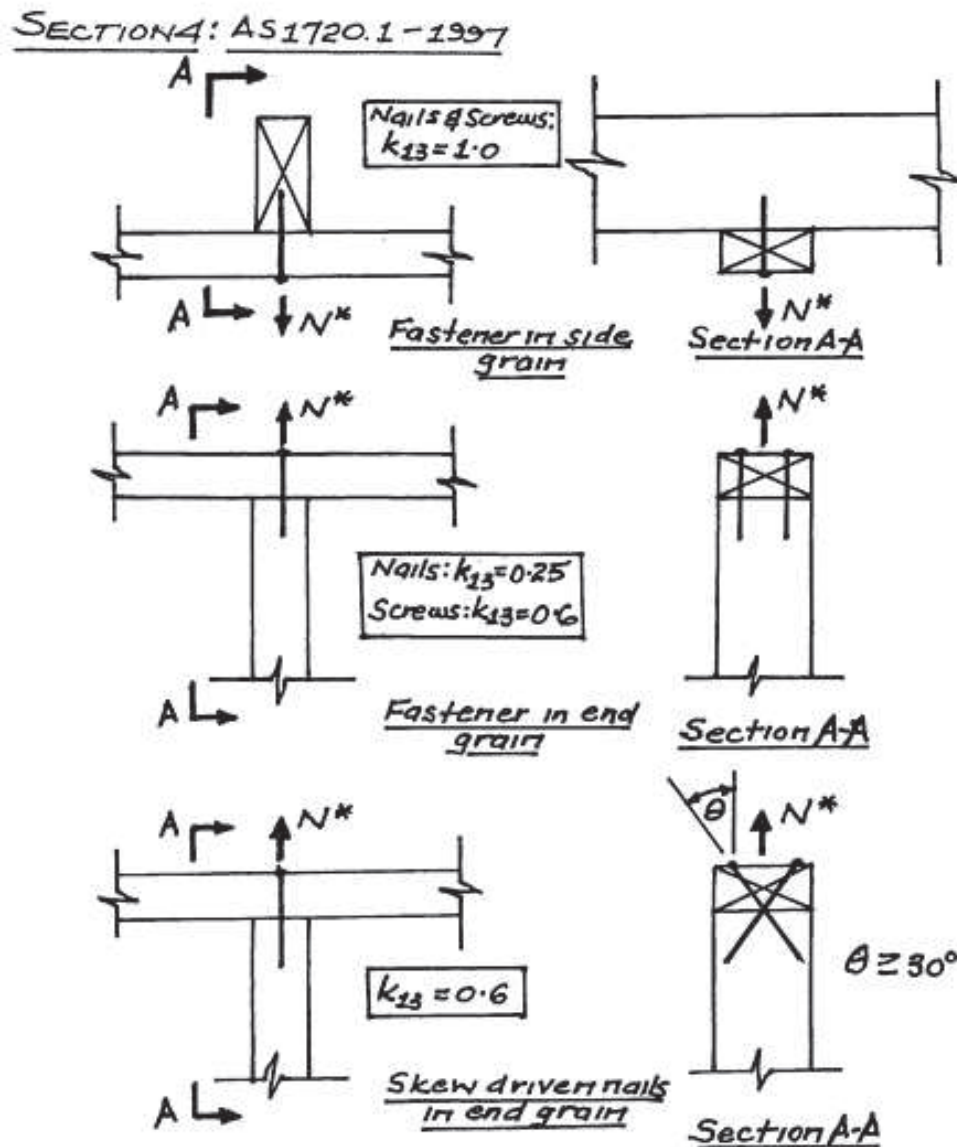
Examples of Type 2 Connections for nails and screws
